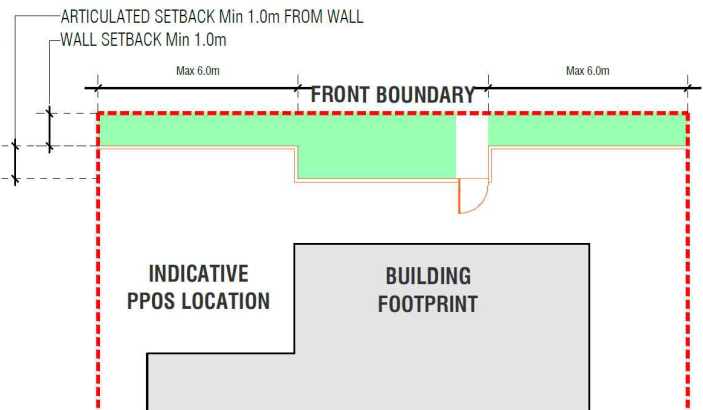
EXAMPLE - COURTYARD WALL, SHOWING A HOME FRONTING OPEN SPACE, WITH AN ARTICULATED GATE ENTRY AND PLANTING ZONE.
